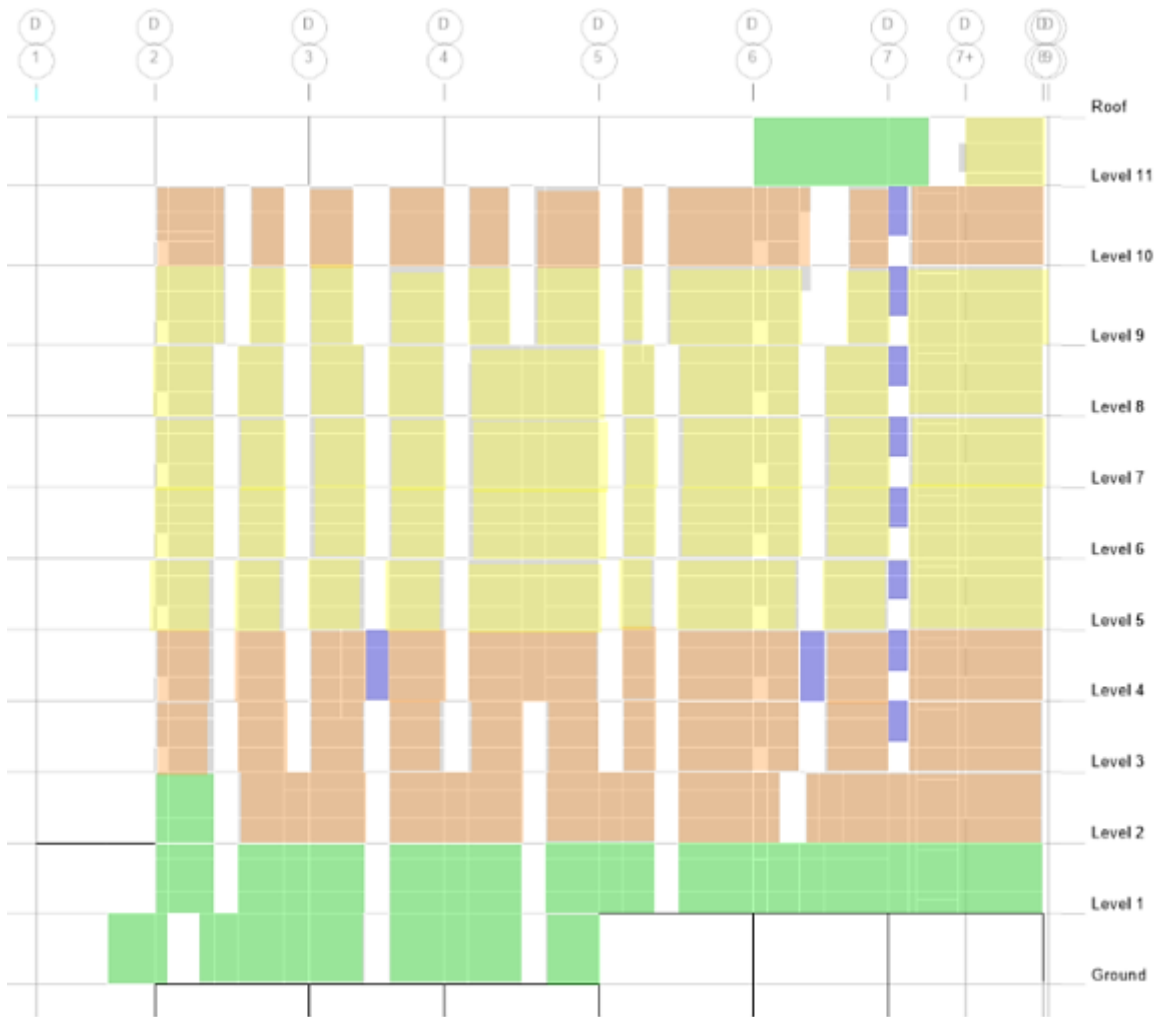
, Gridline D Longitudinal Direction Wall – North Structure
